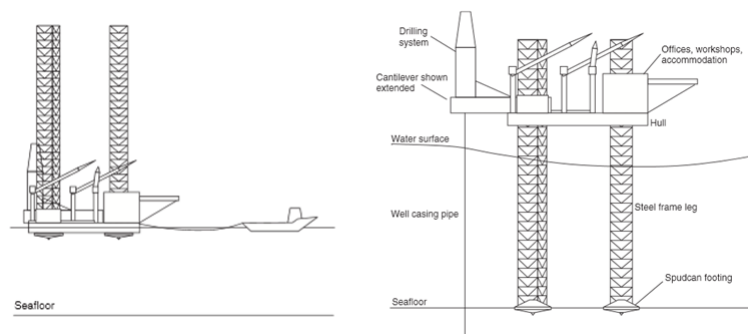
Jack-ups; before and after installation (Dean, 2009)
